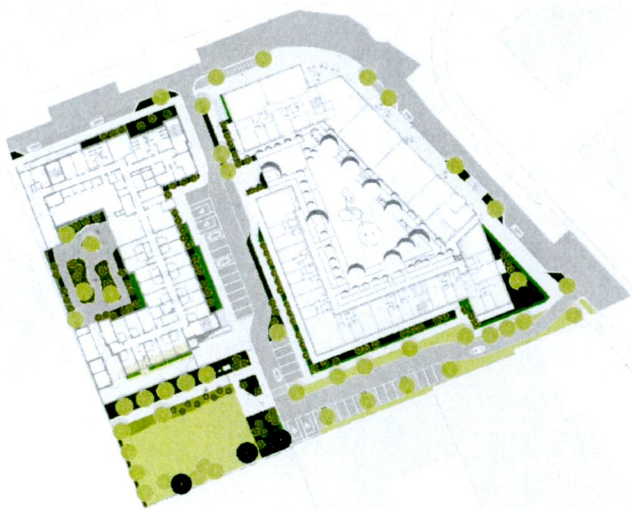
Indicative Development Context: Local Area Plan, indicative blocks layout
